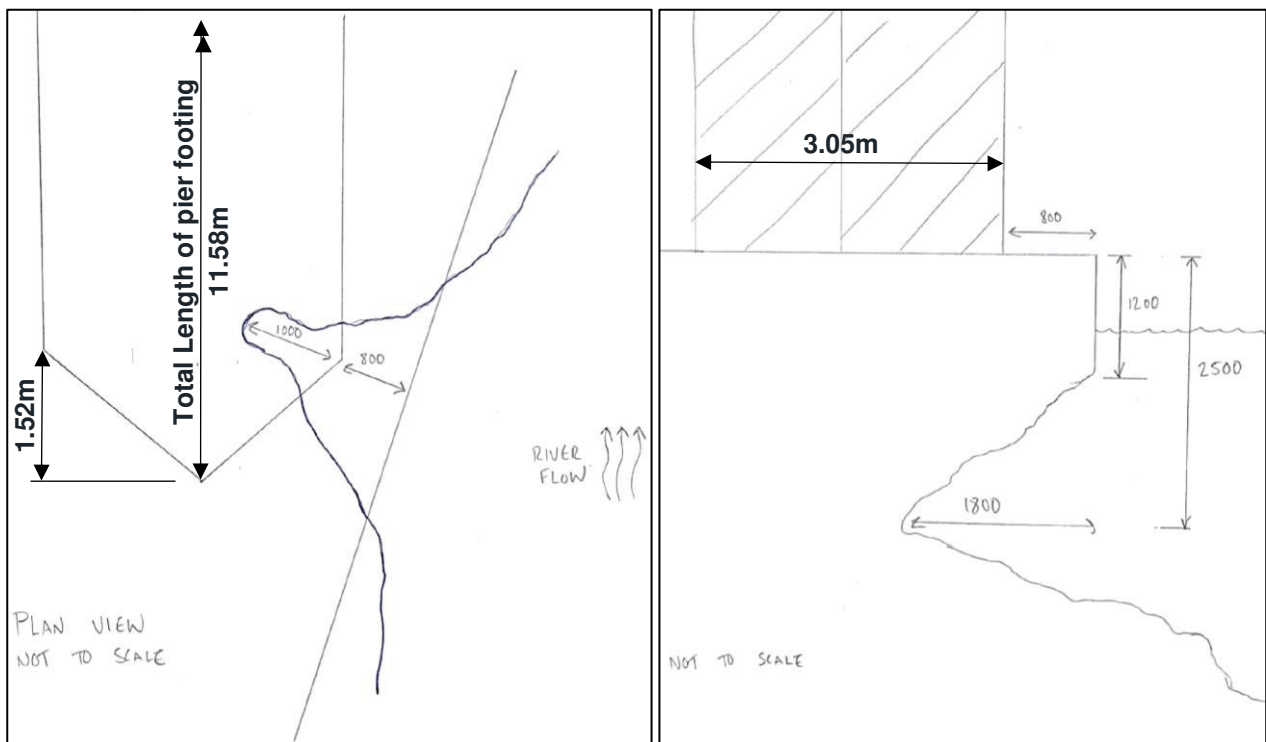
Plan (left) and section (right) of scour undercutting of Pier D of the existing SH8 bridge (Source: Underwater Solutions Ltd, 2014 and PWD, 1885)
